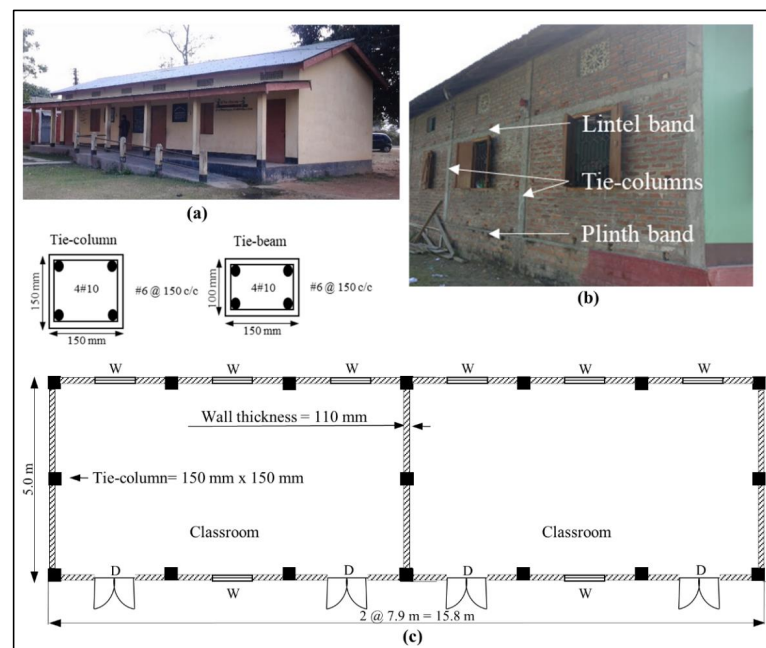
Photographs representative of the case study CM school building (CM1/LR/LD): (a) isometric view, (b) typical longitudinal view, and (c) typical plan dimensions.
